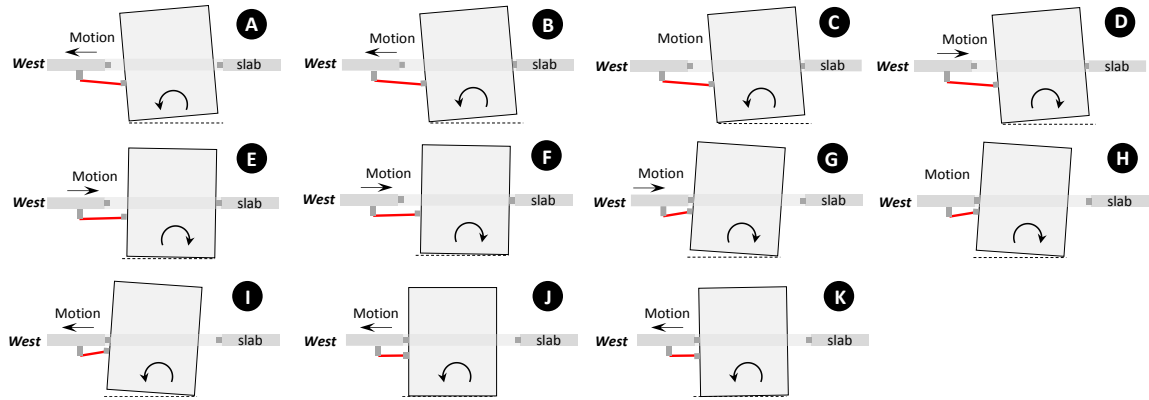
Schematic drawing of deformed structure when the bumper is engaged in Fig. 5-41d.
